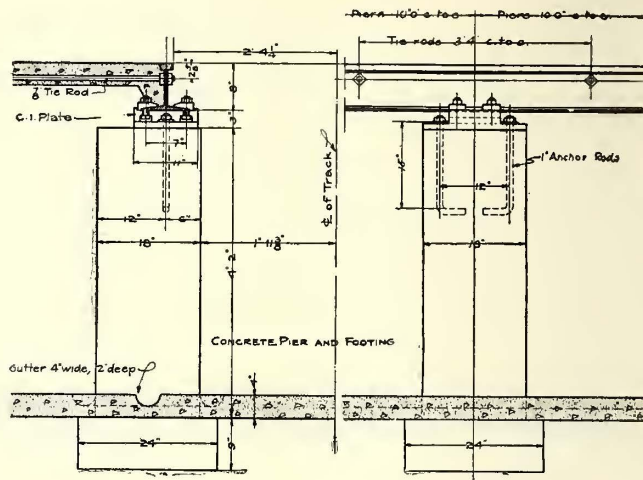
and 35—Types of Pit Construction Using 8-in. T-Rail with Pier or Column Supports
